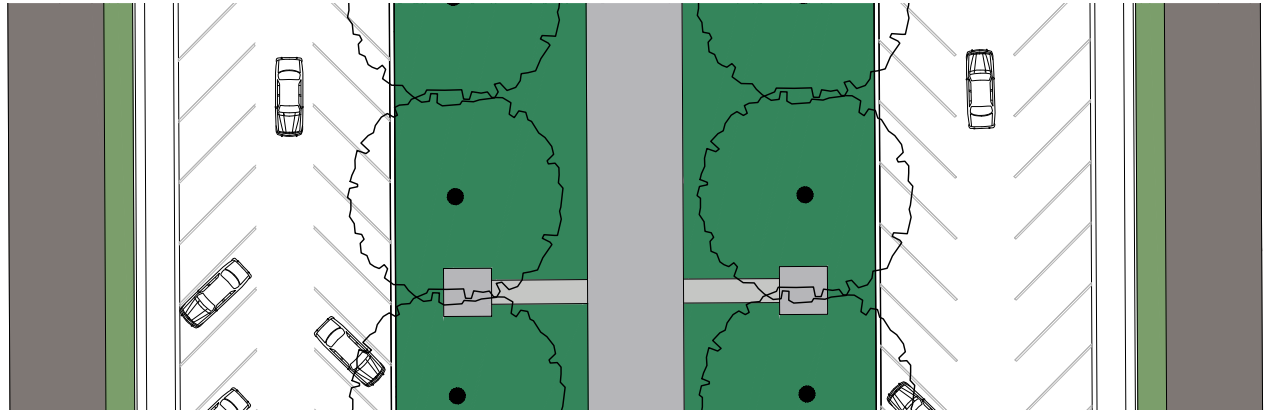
(1). Lake Promenade Street Plan View (illustrative)
